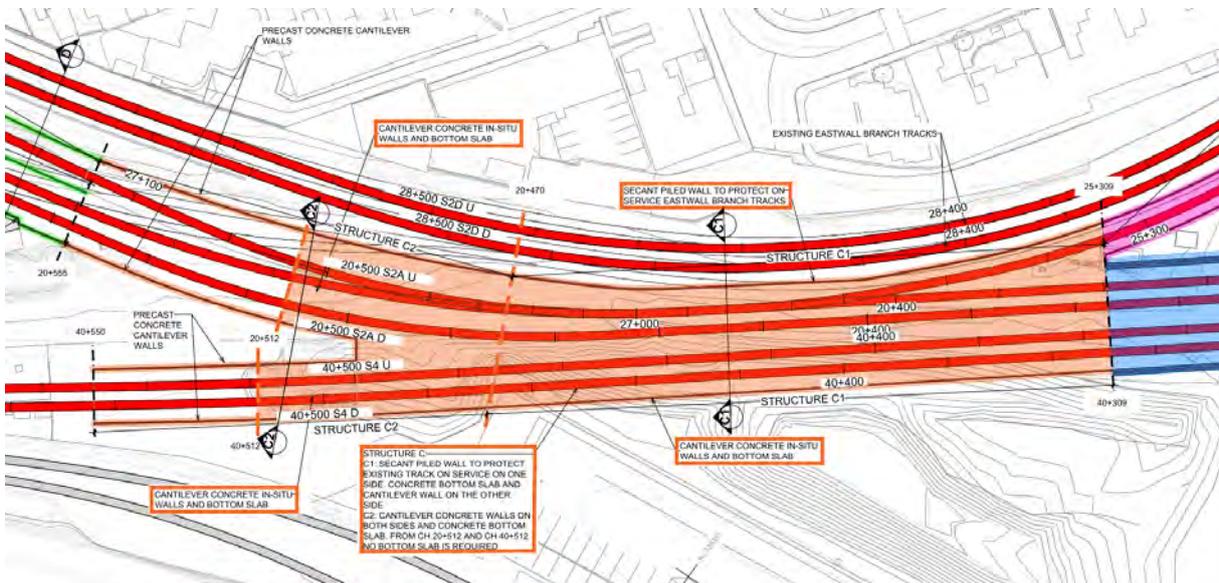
Spencer Dock proposed walls and protection slabs - Structure C
